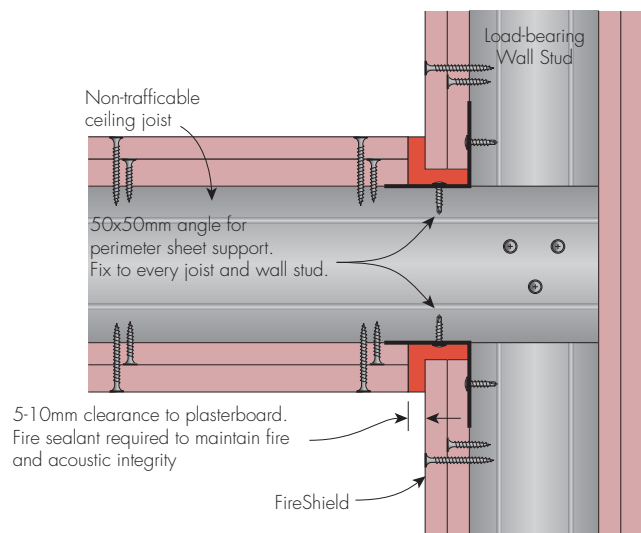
Non-Trafficable Ceiling to Plasterboard Wall
